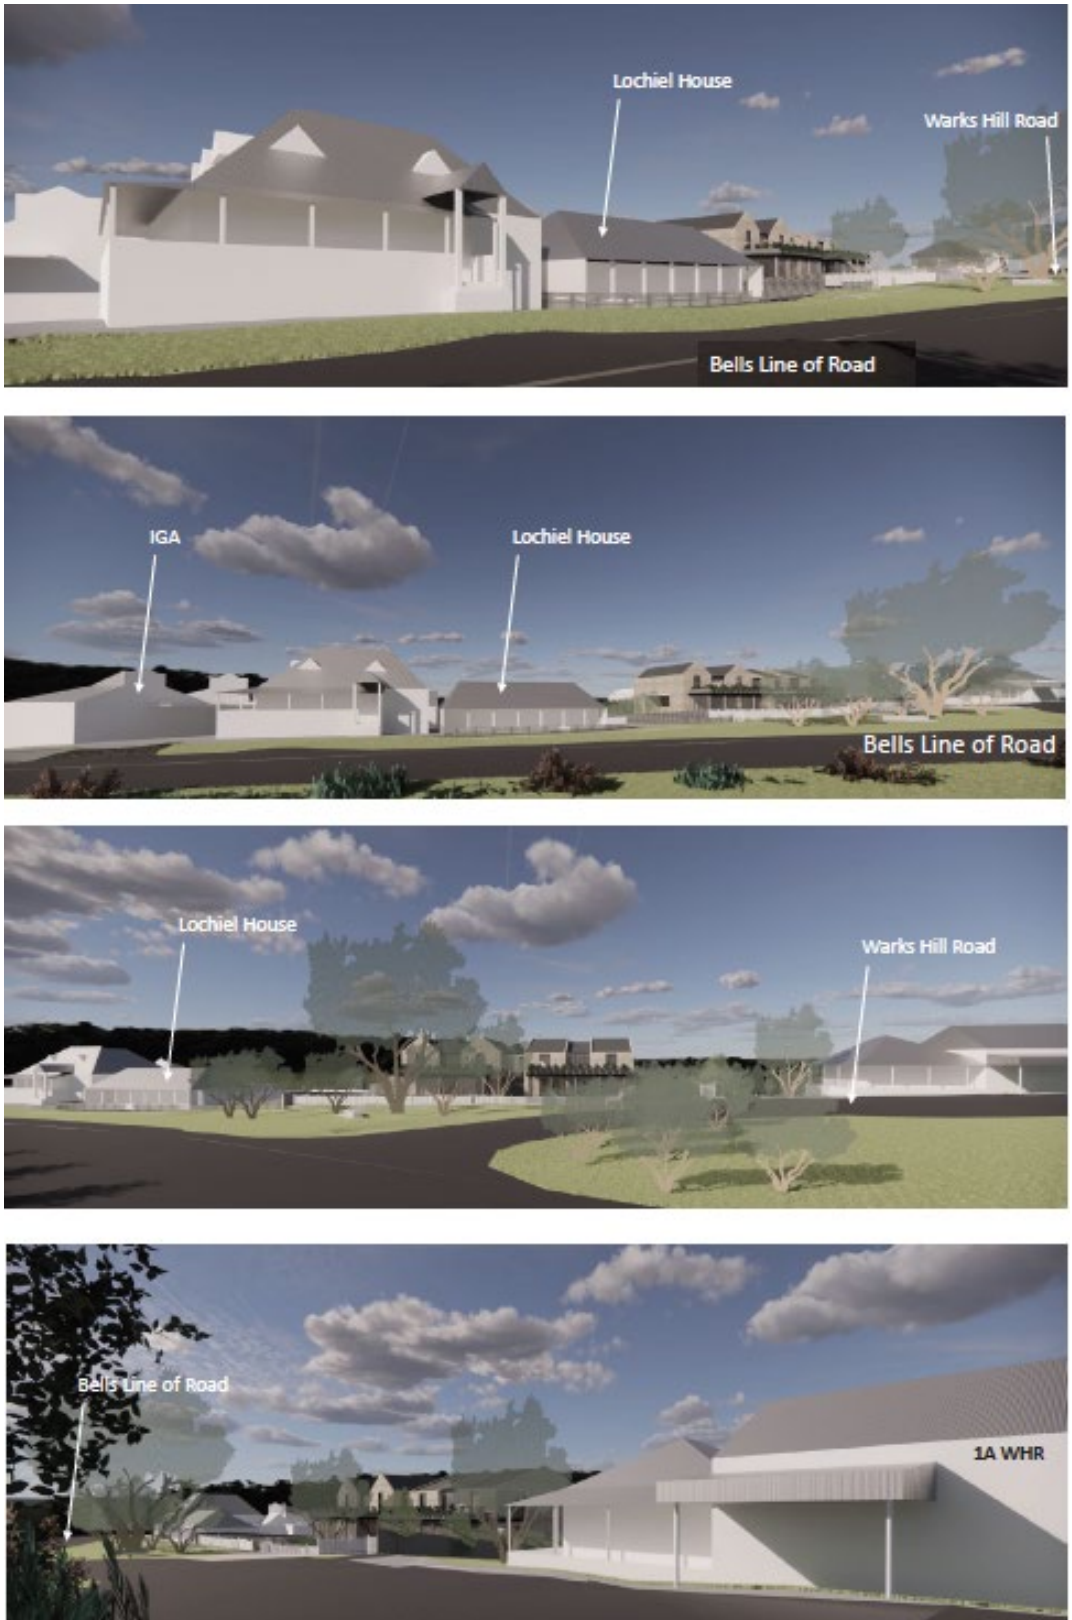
Photomontage of Pub as viewed from Bells Line of Road & Warks Hill Road.
